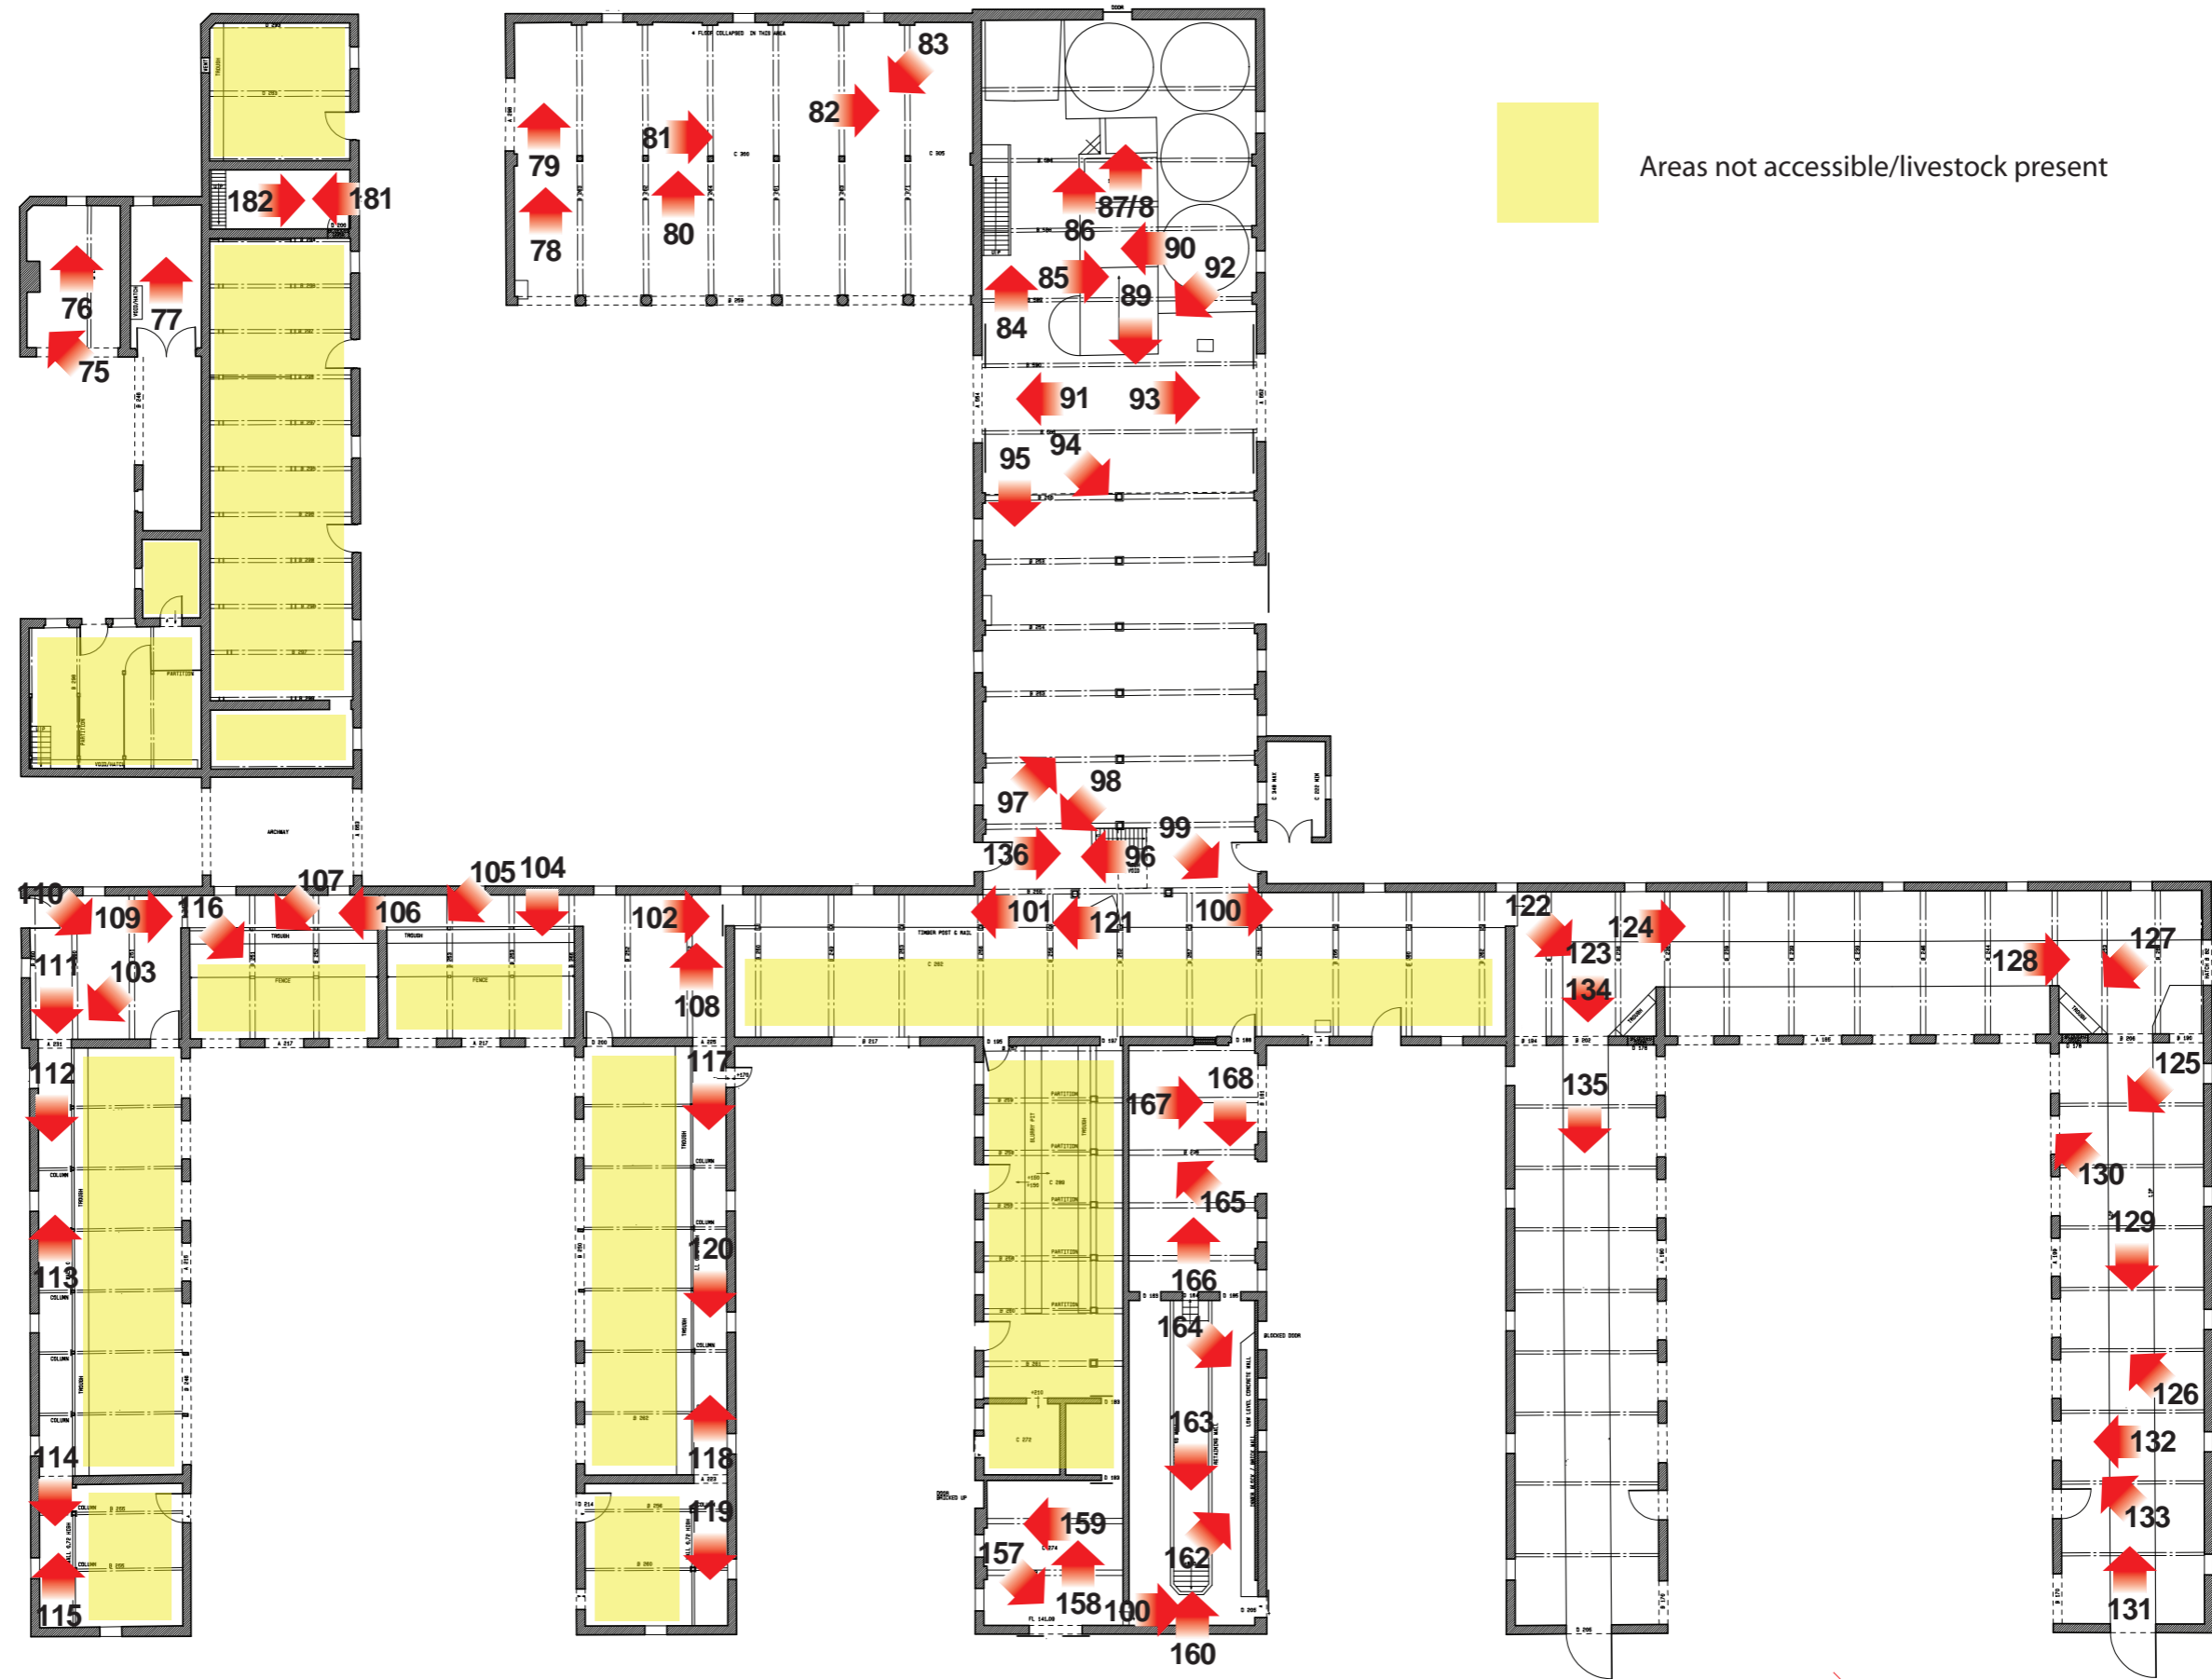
Plan showing directions of photographic plates relating to inside (ground floor) of farm structure
